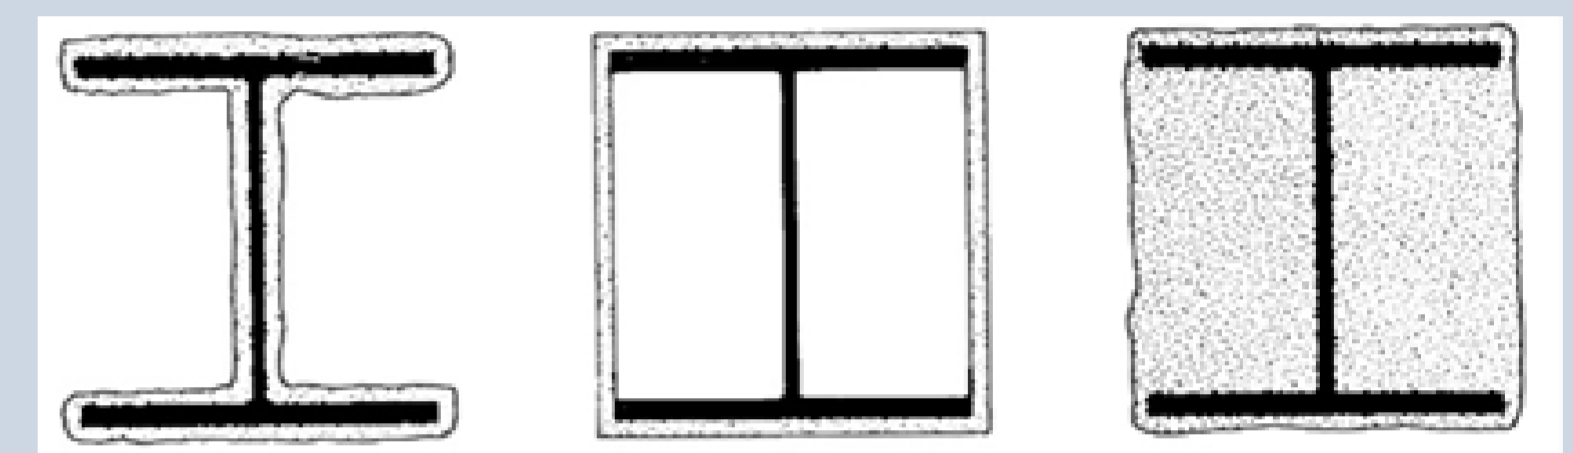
shows the generic design techniques for the protection of steel structures left to right; profile, boxed and solid fill (note solid fill designs are used on sections typically up to 203mm deep)
